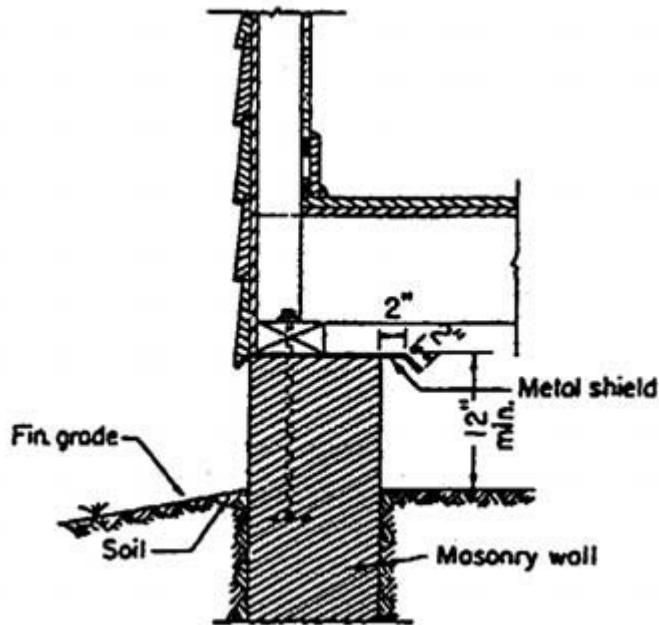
Termite shield over uncapped masonry wall showing minimum clearance from ground on both inside and outside of foundation
